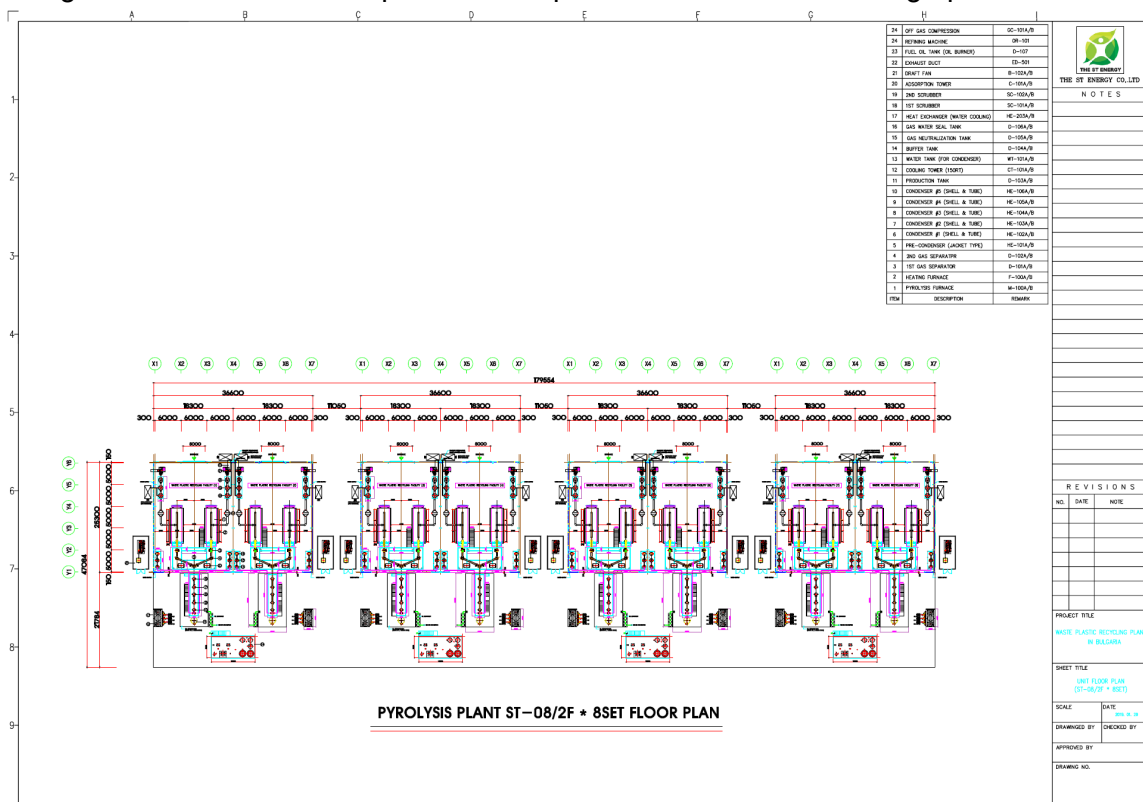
Floor Plan of Recycling Oil Refining Unit
